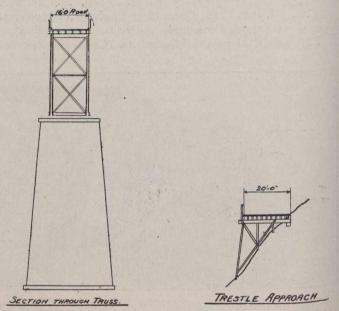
Sections of Abutment and Trestle of New Bridge.
